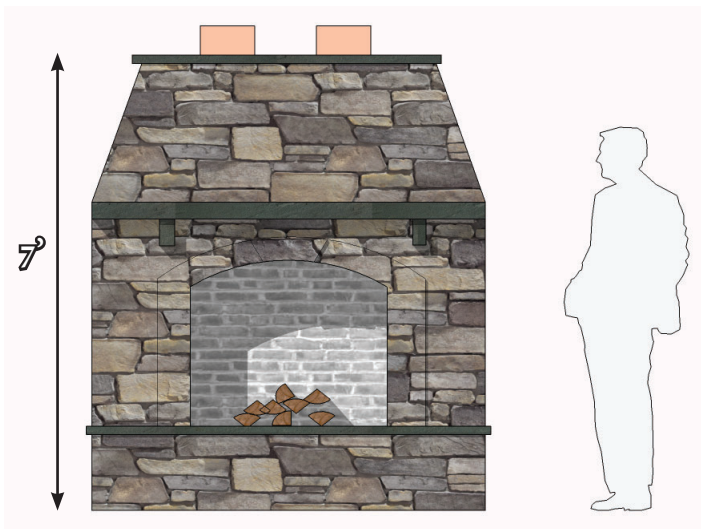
Outdoor fireplaces may be a maximum of 7' tall to be considered under the ACoA process.
